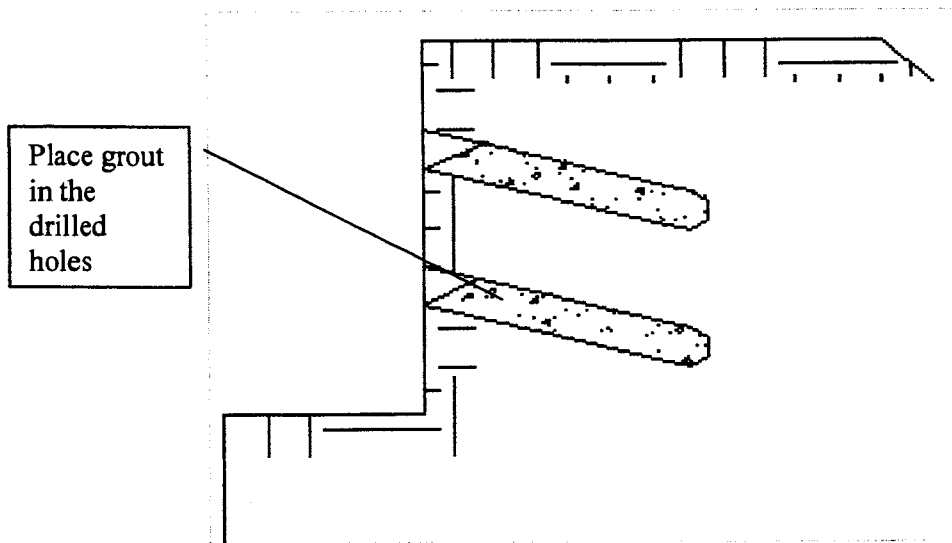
Picture showing step 3 of the construction process of Soil Nail wall
